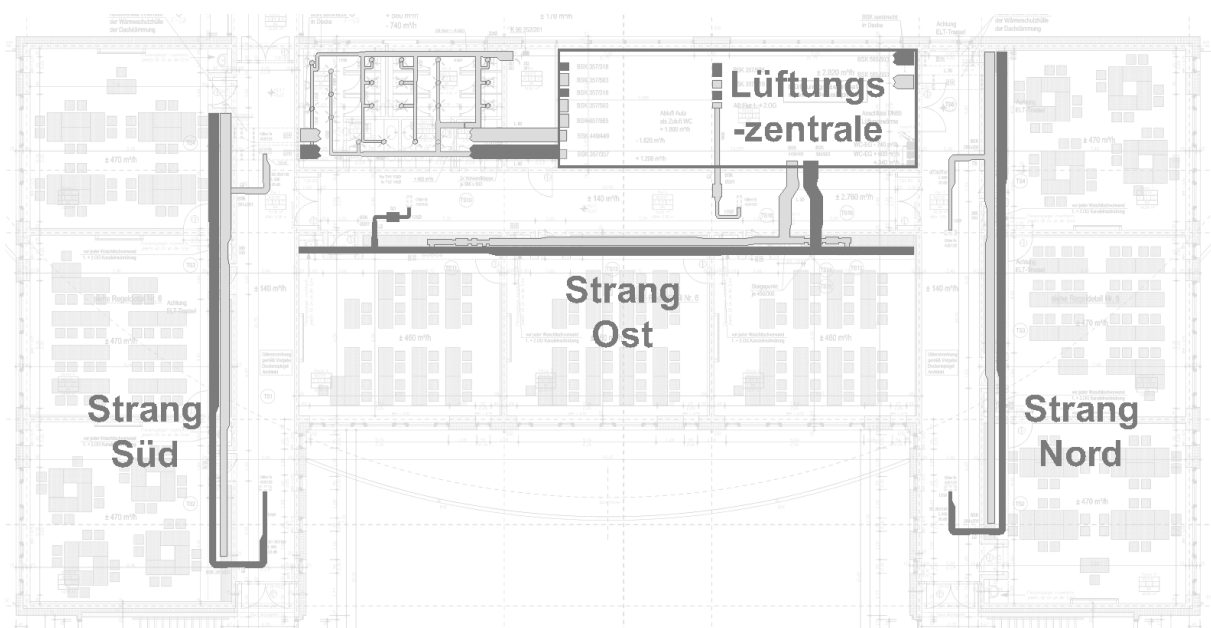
Floor layout of the second floor of the Albert-Schweitzer-Schule (Alsfeld) with short supply air and extract air ducts. Architecture: BLFP, Friedberg / Building Services: Neuplan, Gießen (Source: [AkkP 33]).
